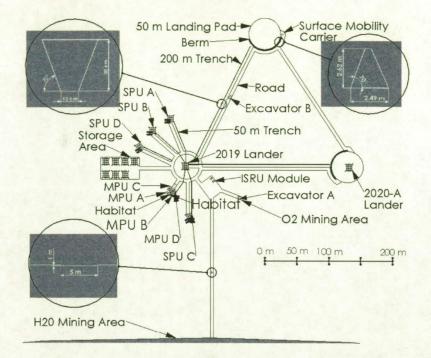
Example 2023-B Typical Lunar Outpost Site Plan
